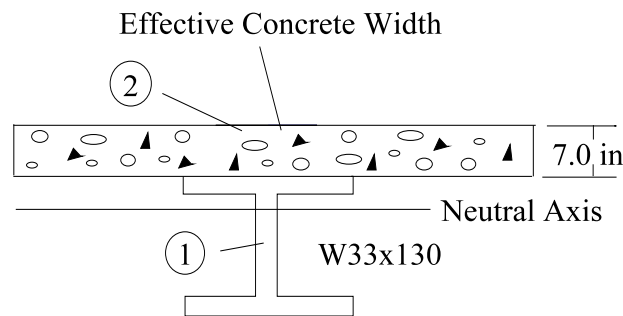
Composite Concrete Bridge Deck, Detail No. 1
